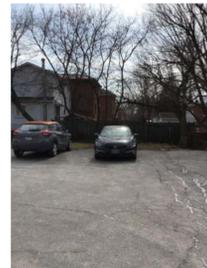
PAINT NEW REGULAR PARKING LINES
